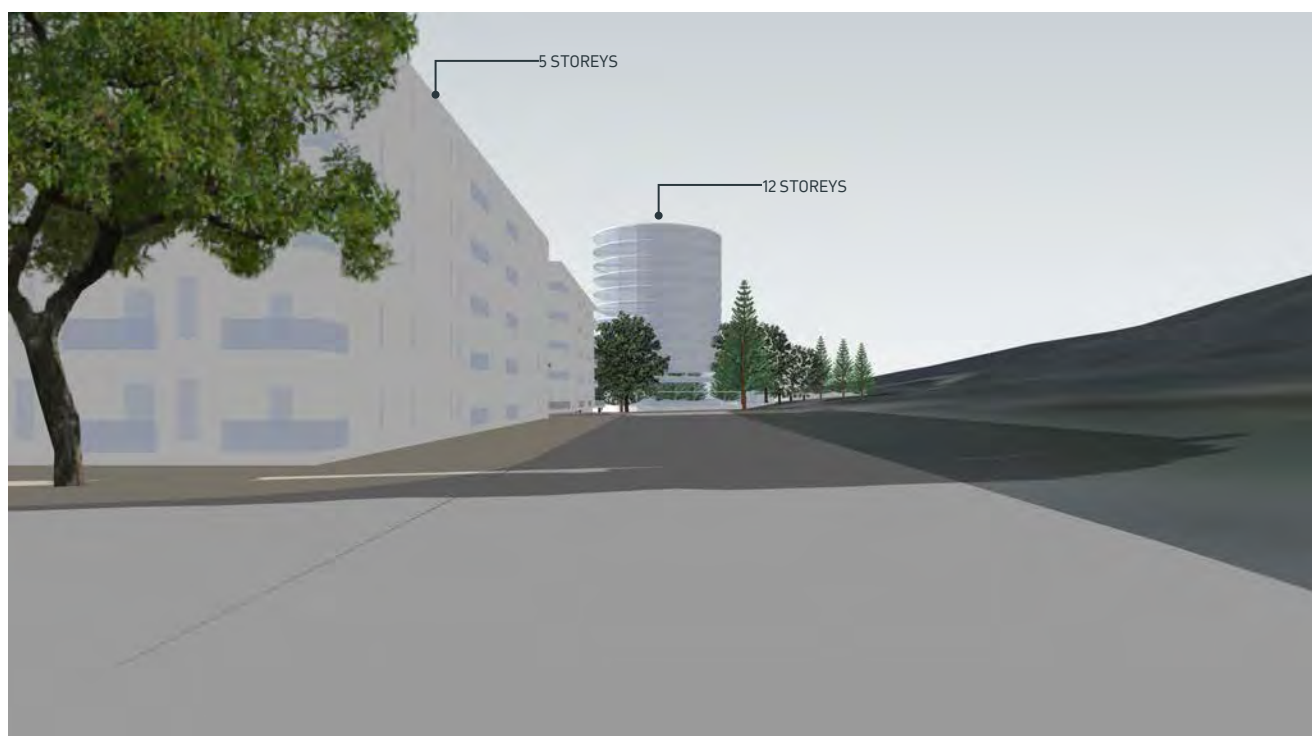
Indicative Built Form (12 Storeys) - Adelaide Crescent looking East
